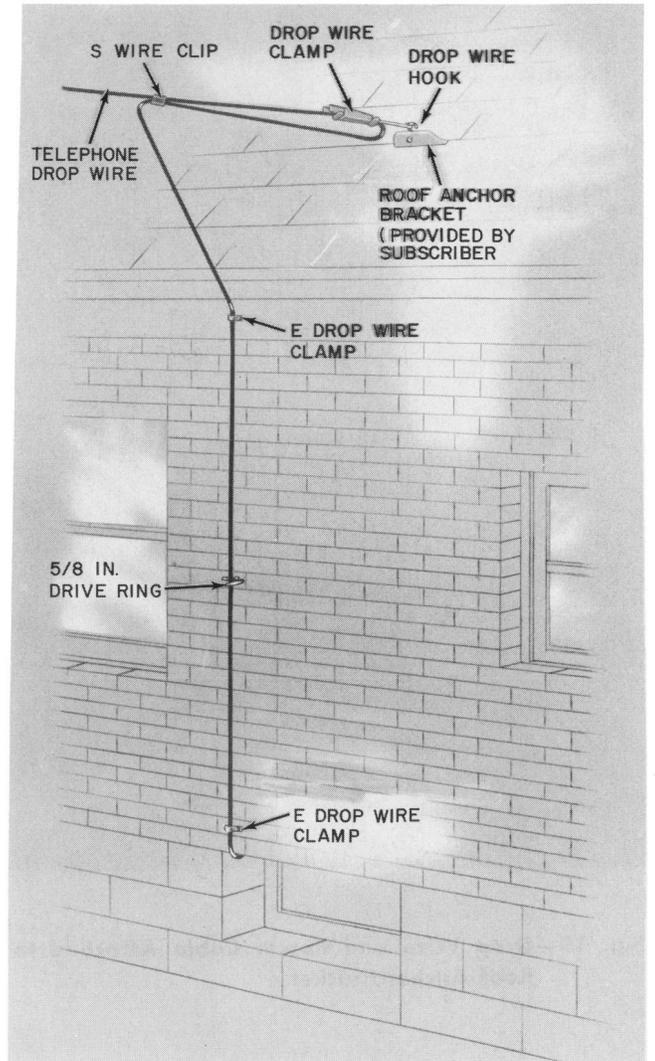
Drop Wire Attached to Roof Anchor Bracket
